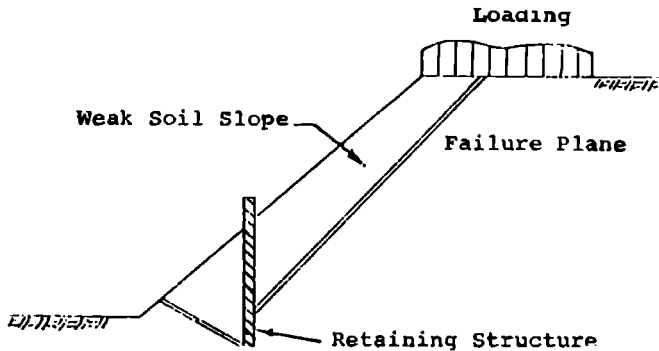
Weak Soil Slope Intercepted by a Retaining Structure
